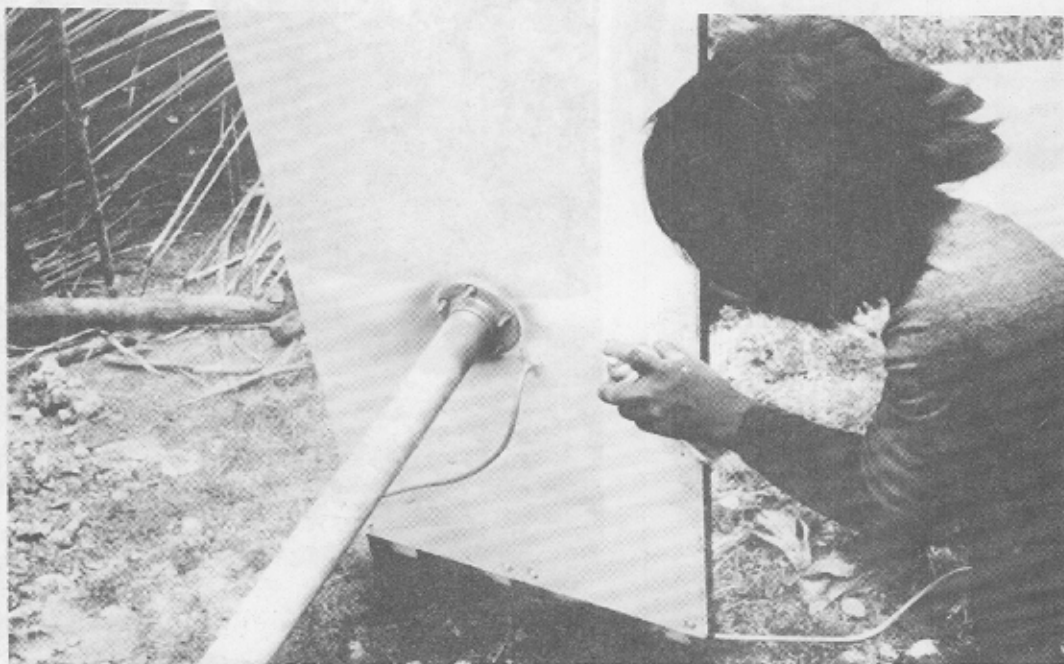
Spraying the pipe. Apply the cold galvanizing spray to the threaded end of the galvanized pipe to prevent rust. (Note: The face of the solar panels should remain covered with cardboard or cloth until the well installation is complete).
